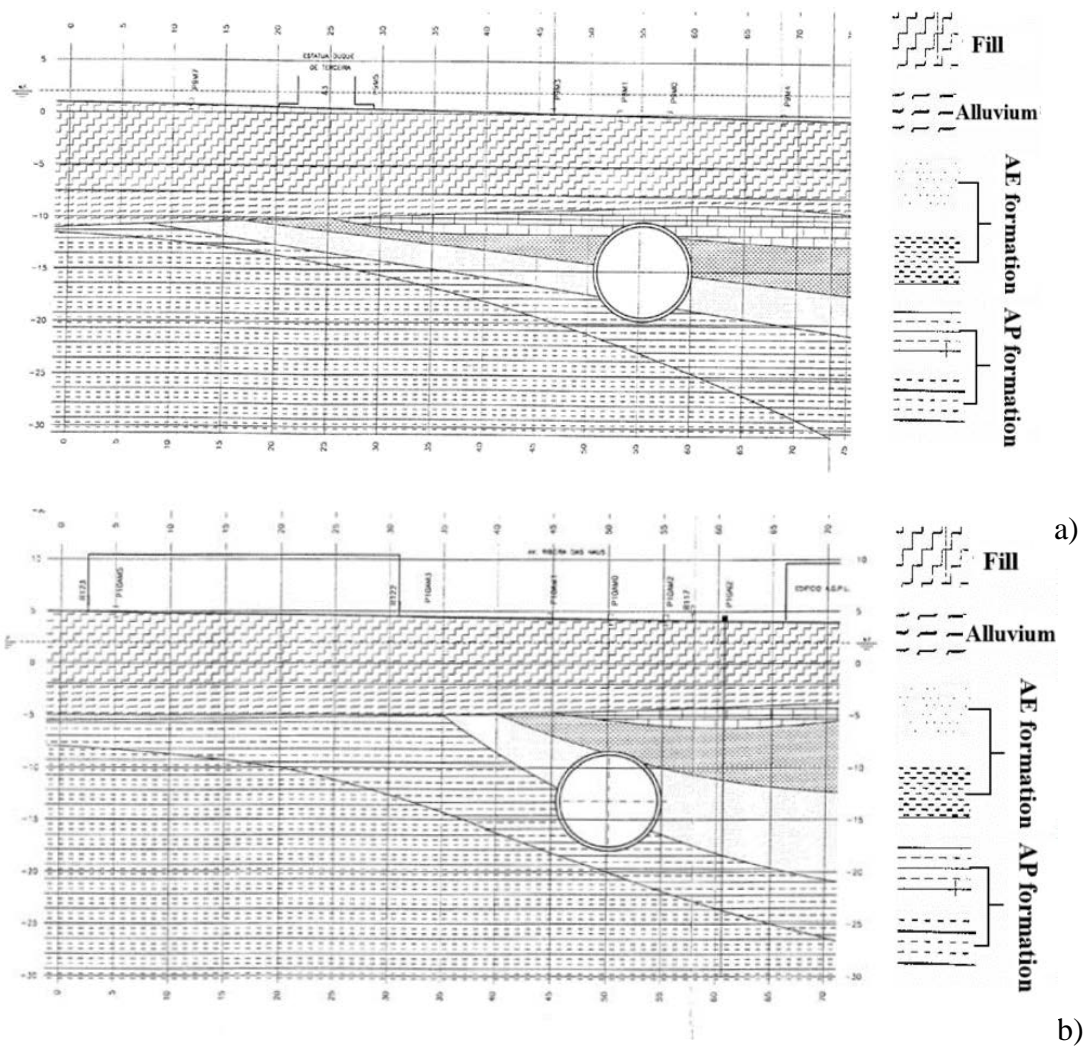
Cross-section of the geology of the instrumented sections: a) P9; b) P10A (adapted from Amaral, 2006).
